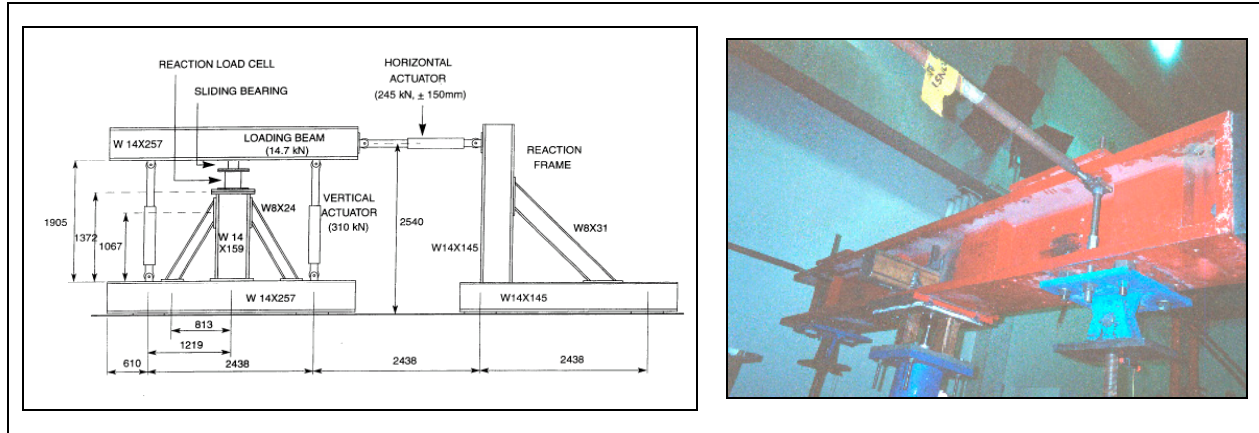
Schematic of the original configuration of the isolator testing machine (all dimensions in mm) and a photograph of the original lateral bracing configuration. Note the connection only at the top flange of the loading beam.
